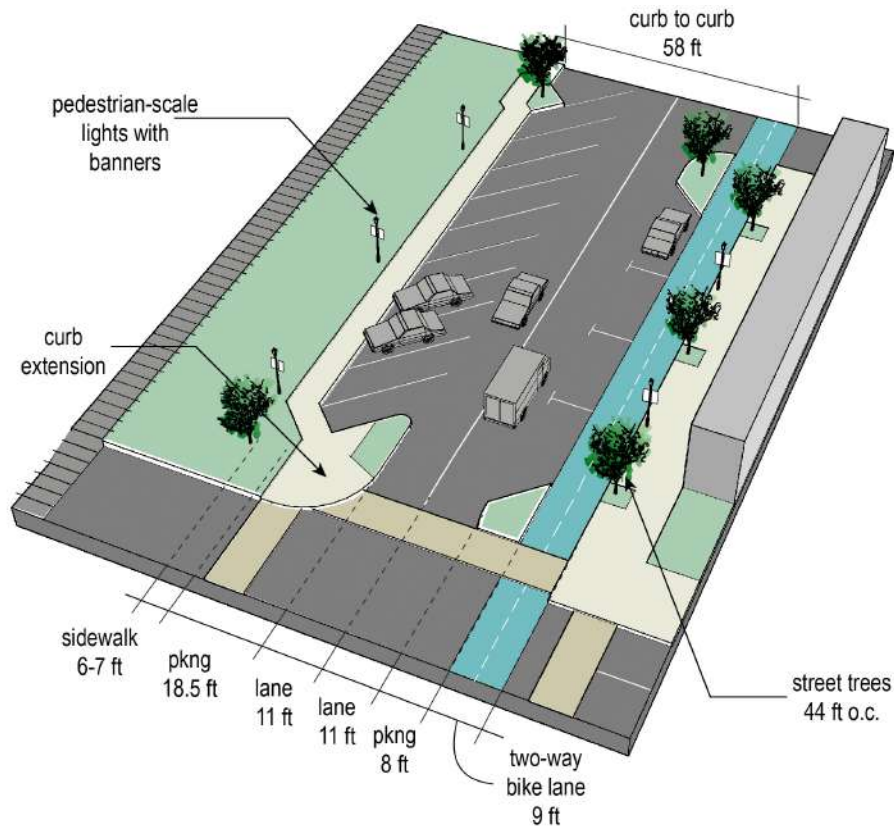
Downtown Irondale Recommendations – Potential First Avenue South Street Section of the 2100 block
